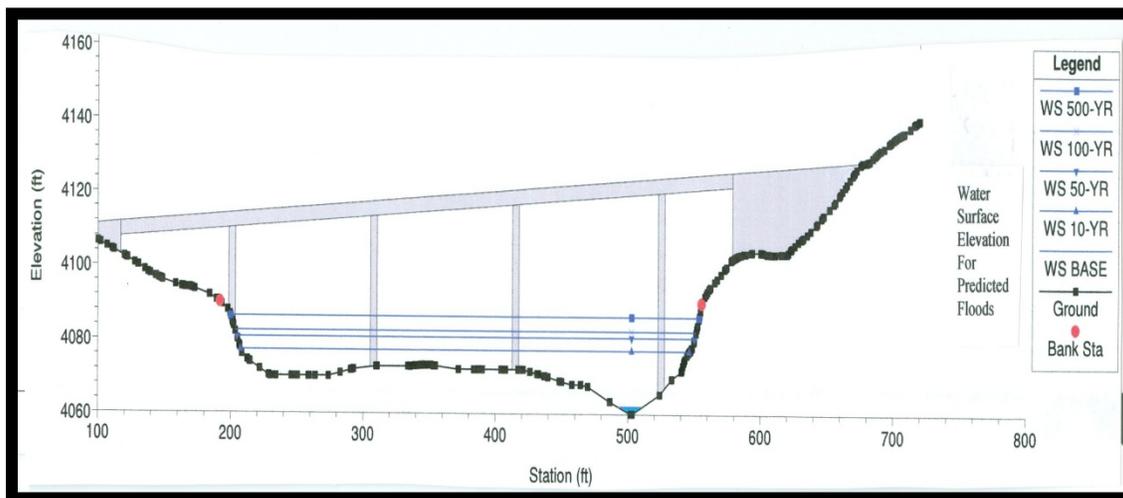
Preliminary Drawing of Proposed Bridge Alternative B
